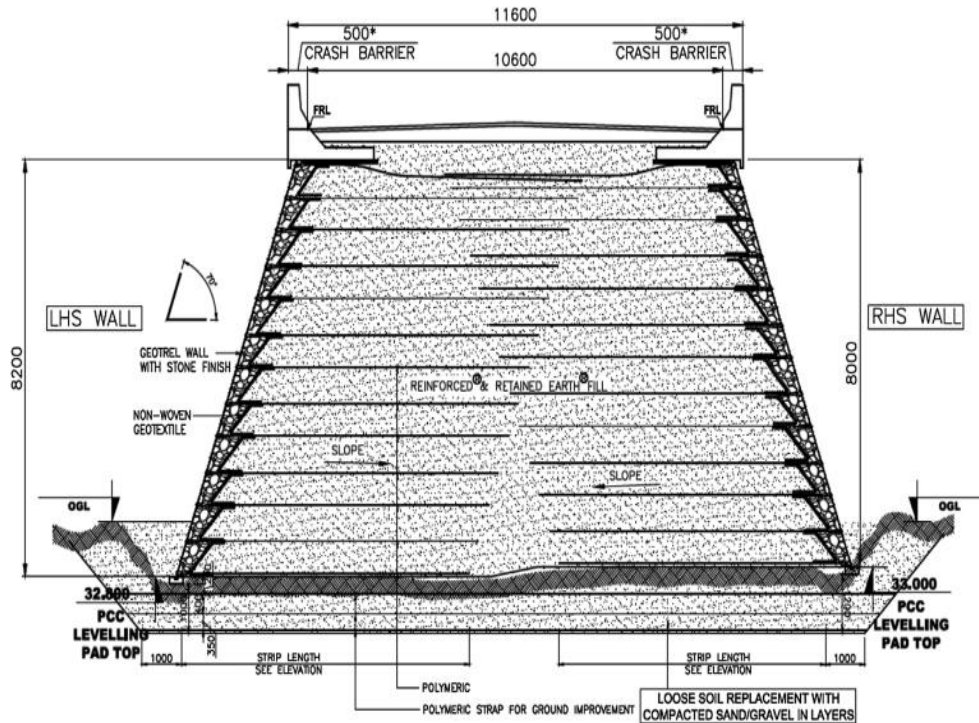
The cross-sectional drawing of reinforced earth wall at Kaljani West Bengal [10].
